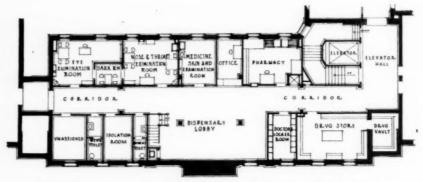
Samaritan Hospital-Administration building. Basement floor plan.
